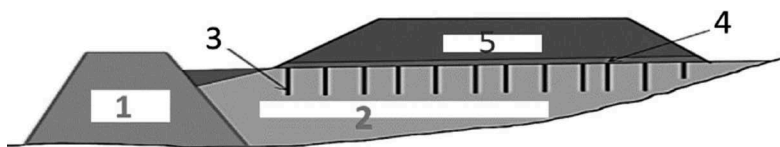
Upgrade to existing waste lagoon with dry stacking. 1 – Existing dam, 2 – existing waste lagoon, 3 – wick drain, 4 – granular bedding, 5 – dry stacking.
